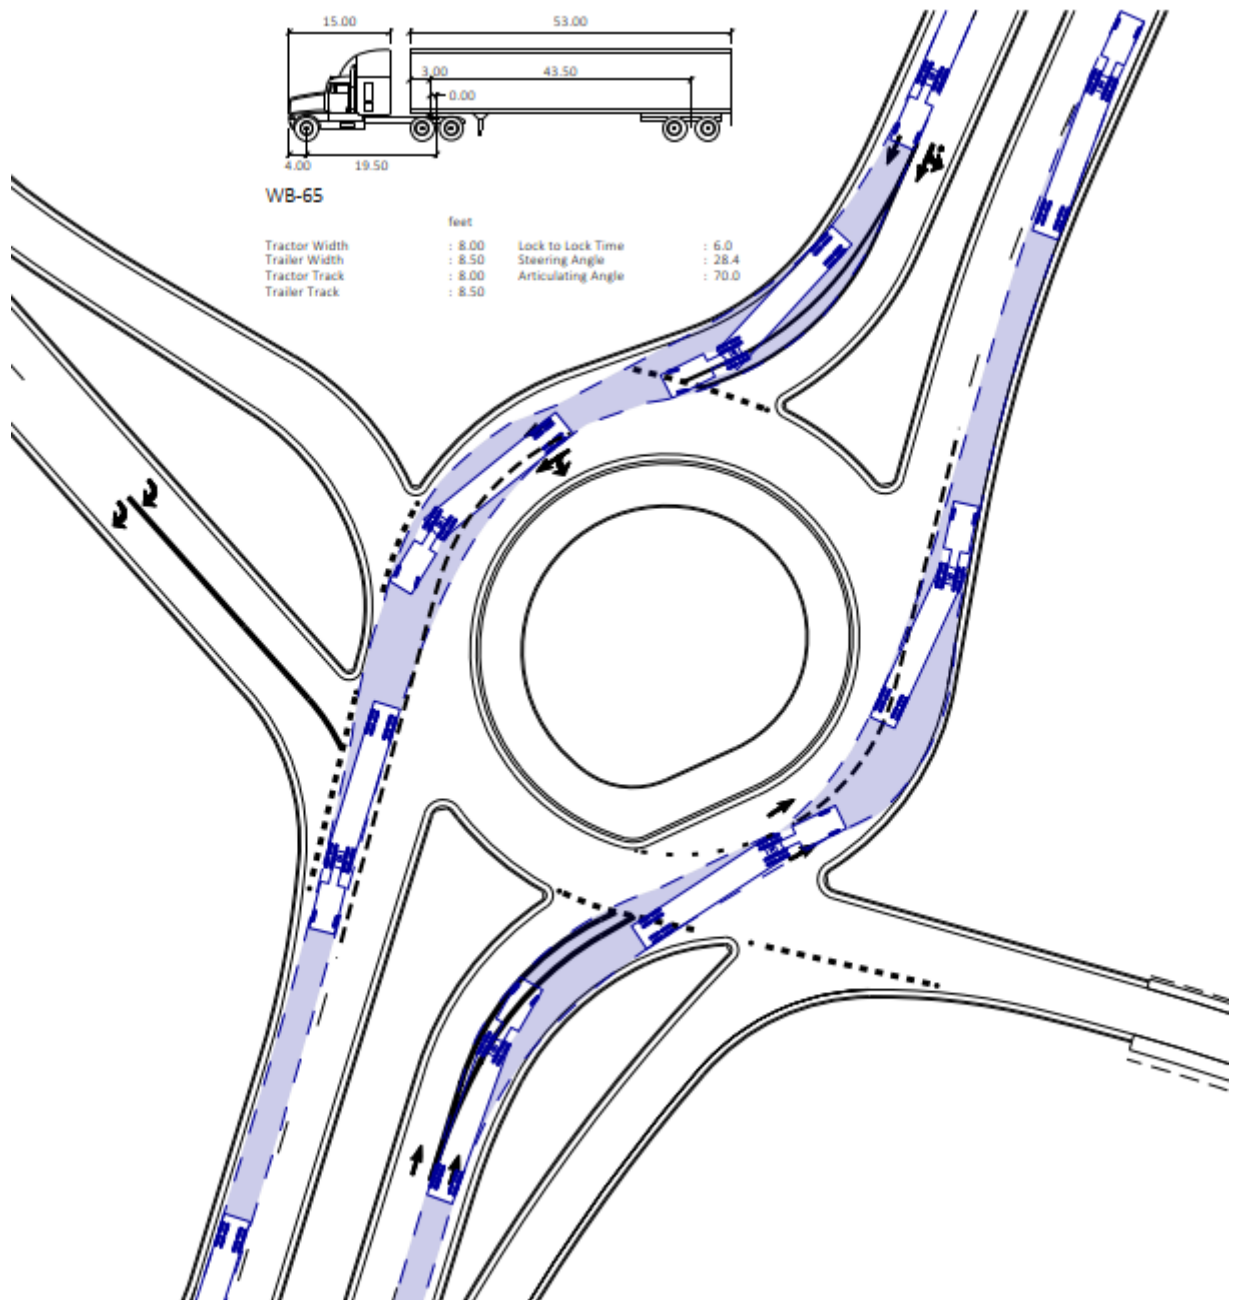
Case 2 Roundabout Design (Gore pavement marking between entry lanes)
